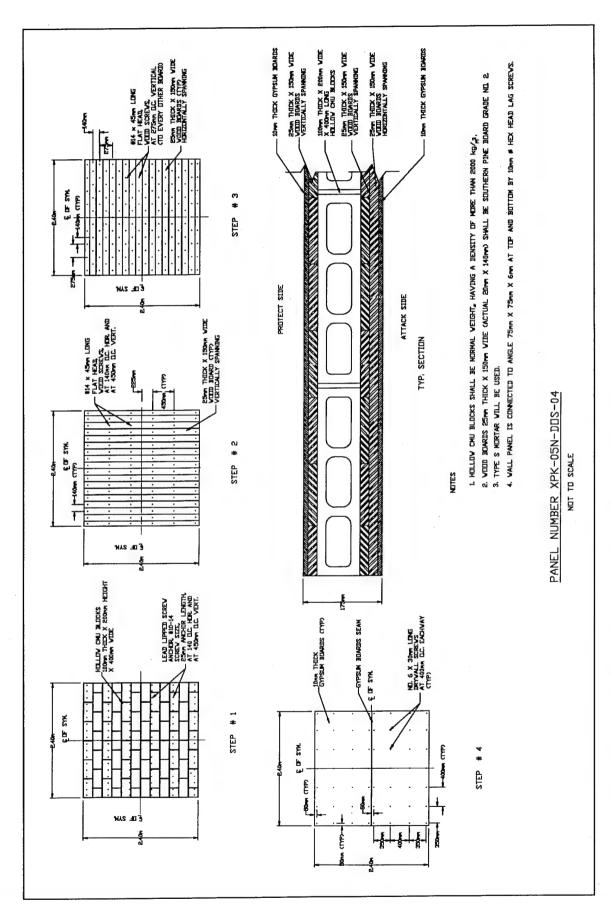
Engineering drawings for wall panel XPK-05N-DOS-04 (SI units)
